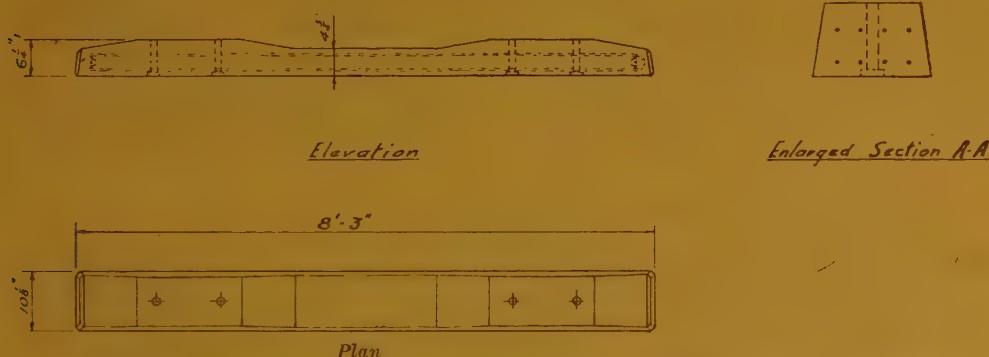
Pre-stressed concrete sleeper with positive anchorage. British Railways.
